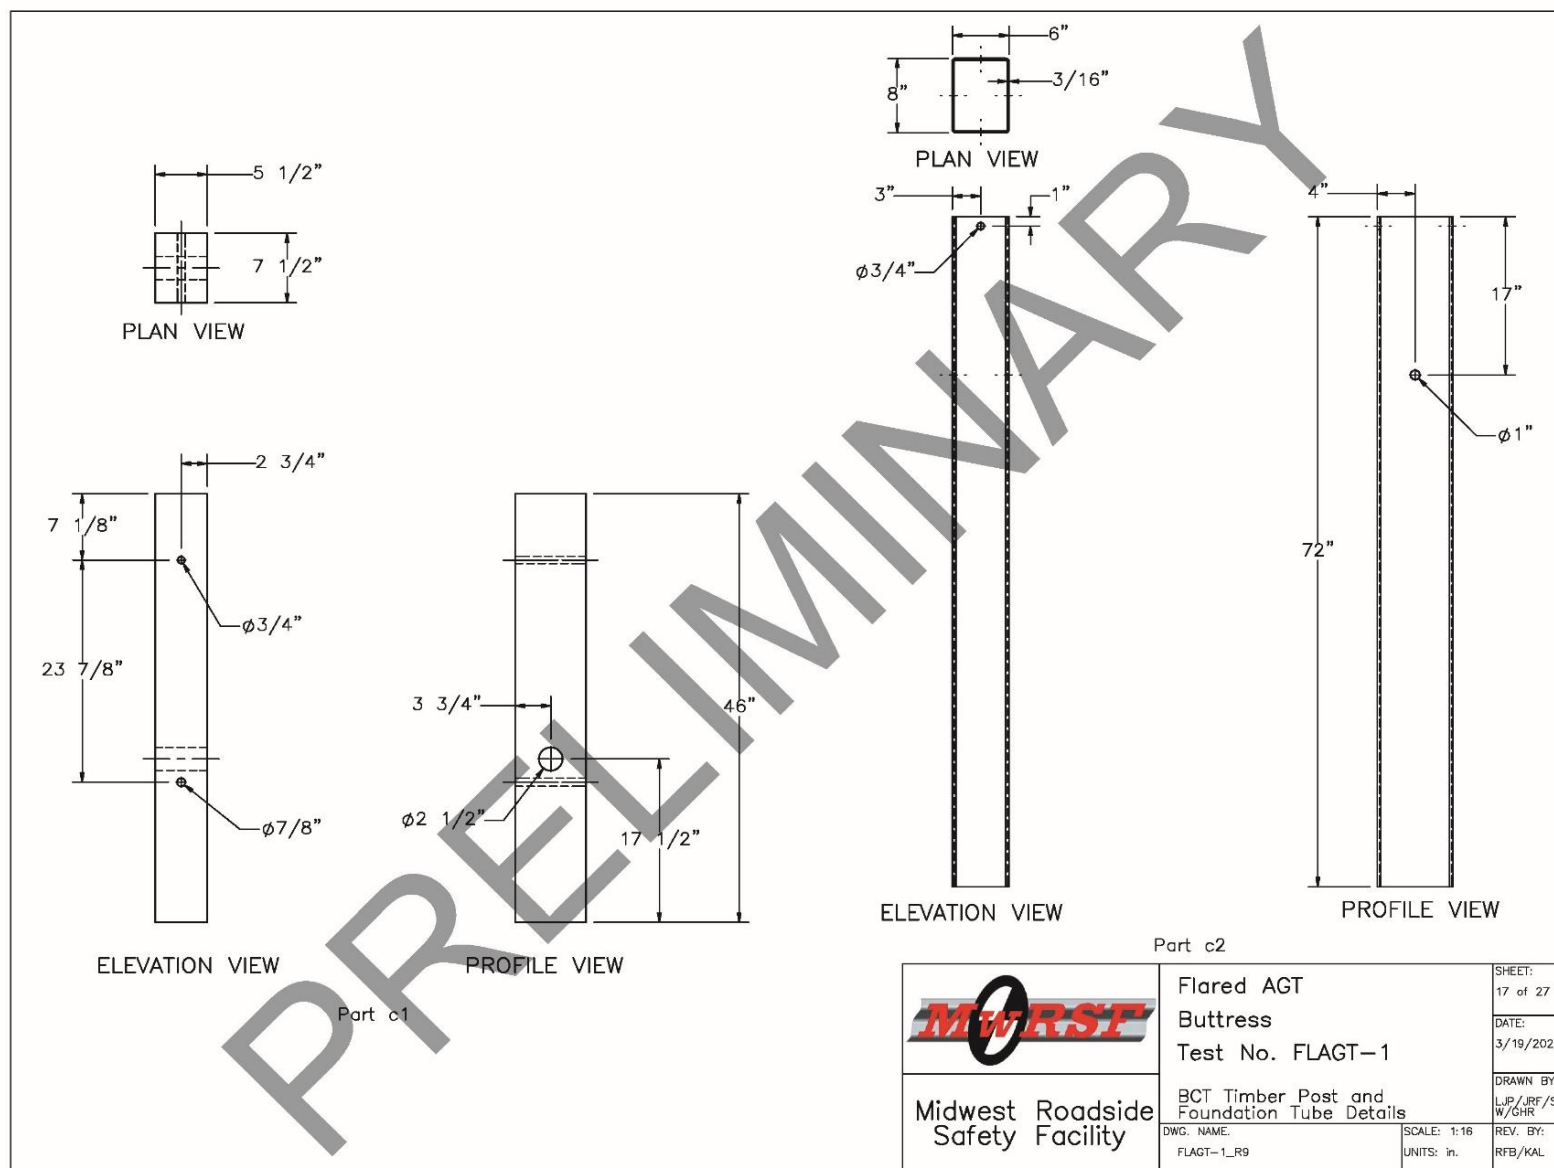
BCT Timber Post and Foundation Tube Details, Test No. FLAGT-1
